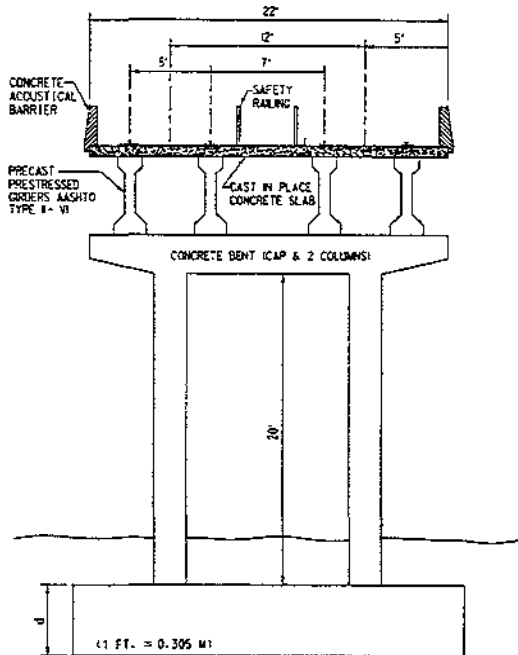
Typical Section of Elevated Structure Studied [16]
